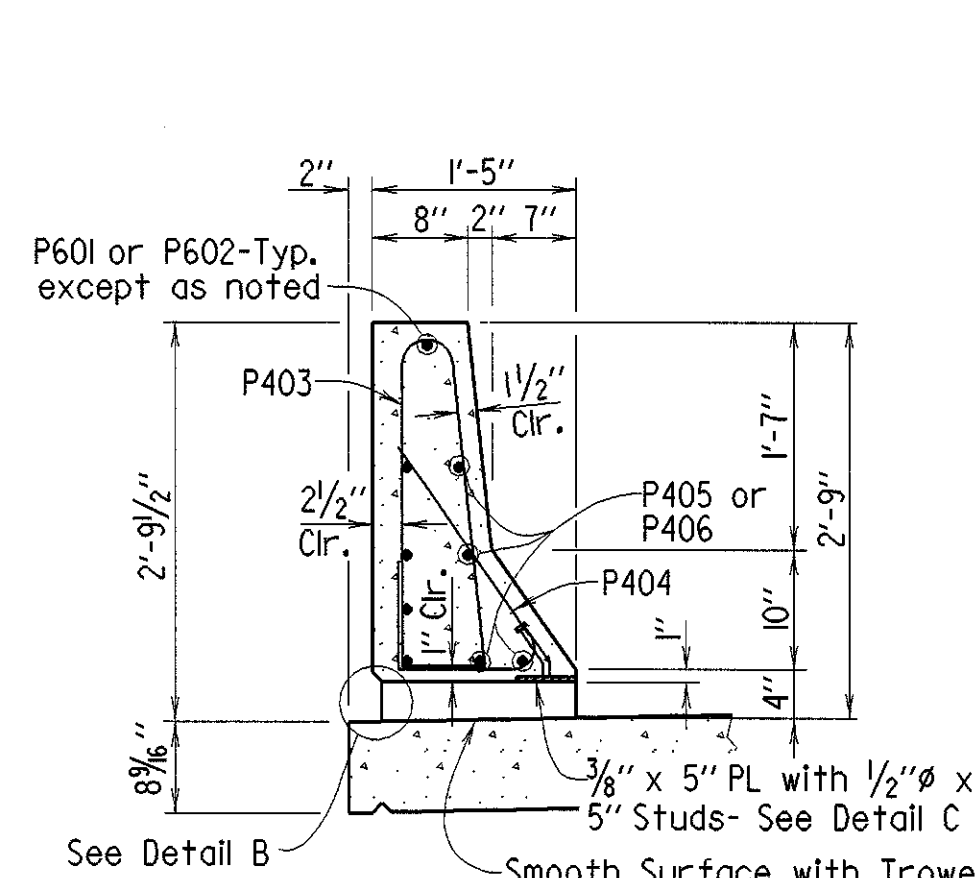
'-5 5/16" CLOSED PARA. PANEL
